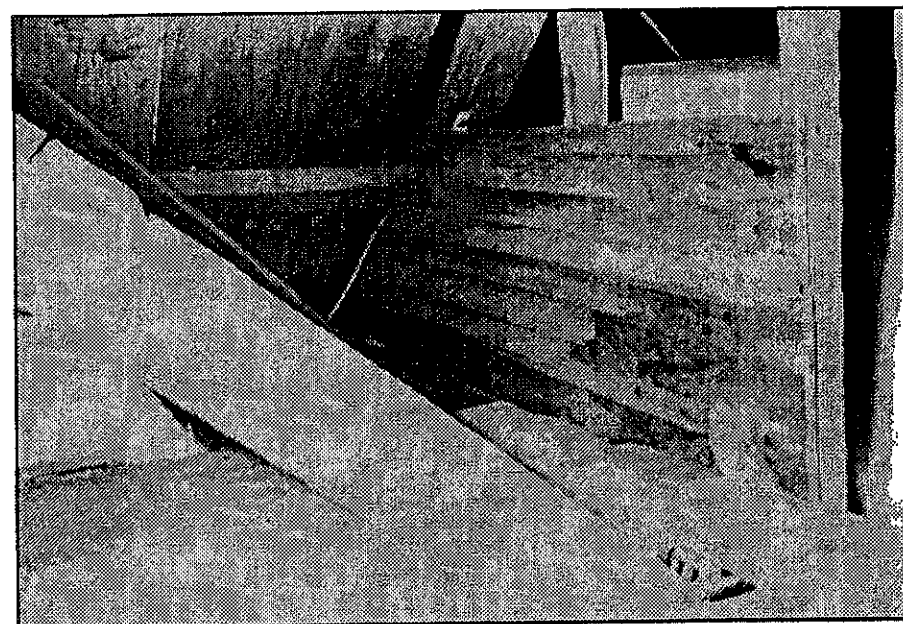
View in the attic showing Building I roof at left, building II gable-end clapboarding at right, and the underside of the roof erected when building I joined building II. Horace Brandt photograph.
